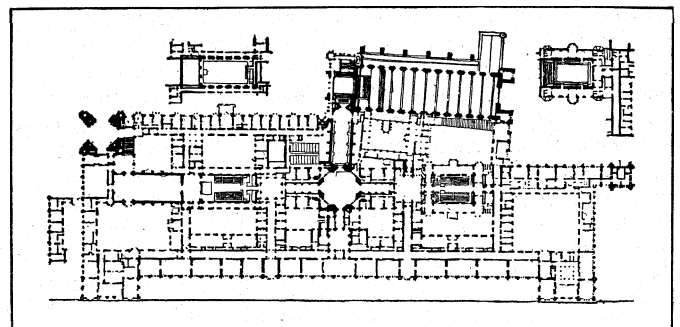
PLAN OF PRINCIPAL FLOOR, HOUSES OF PARLIAMENT, WESTMINSTER
